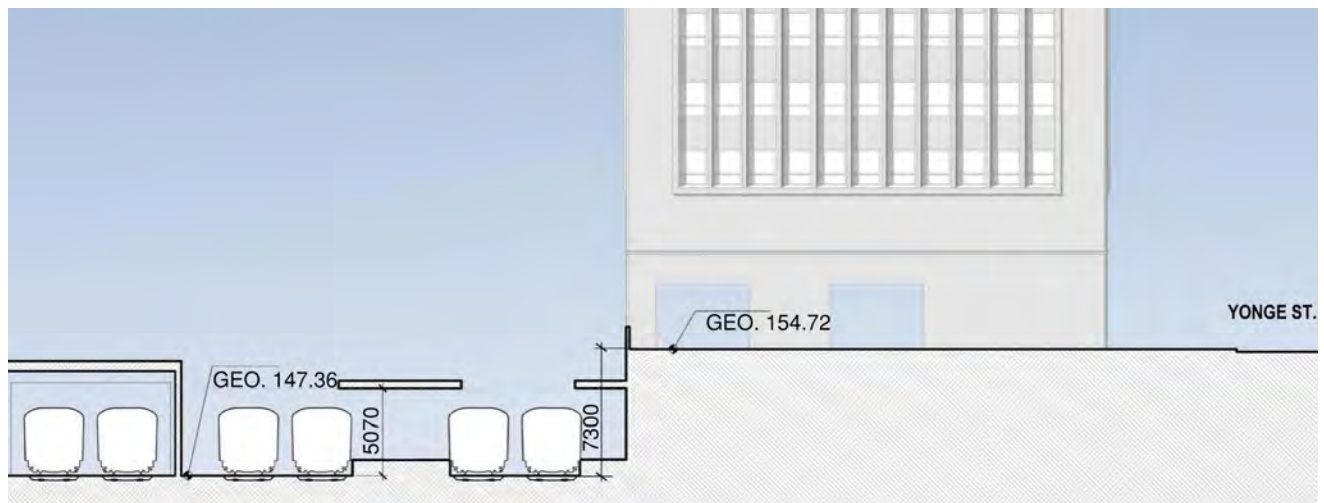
Site section 8- Davisville Station platform and North of Substation Building
